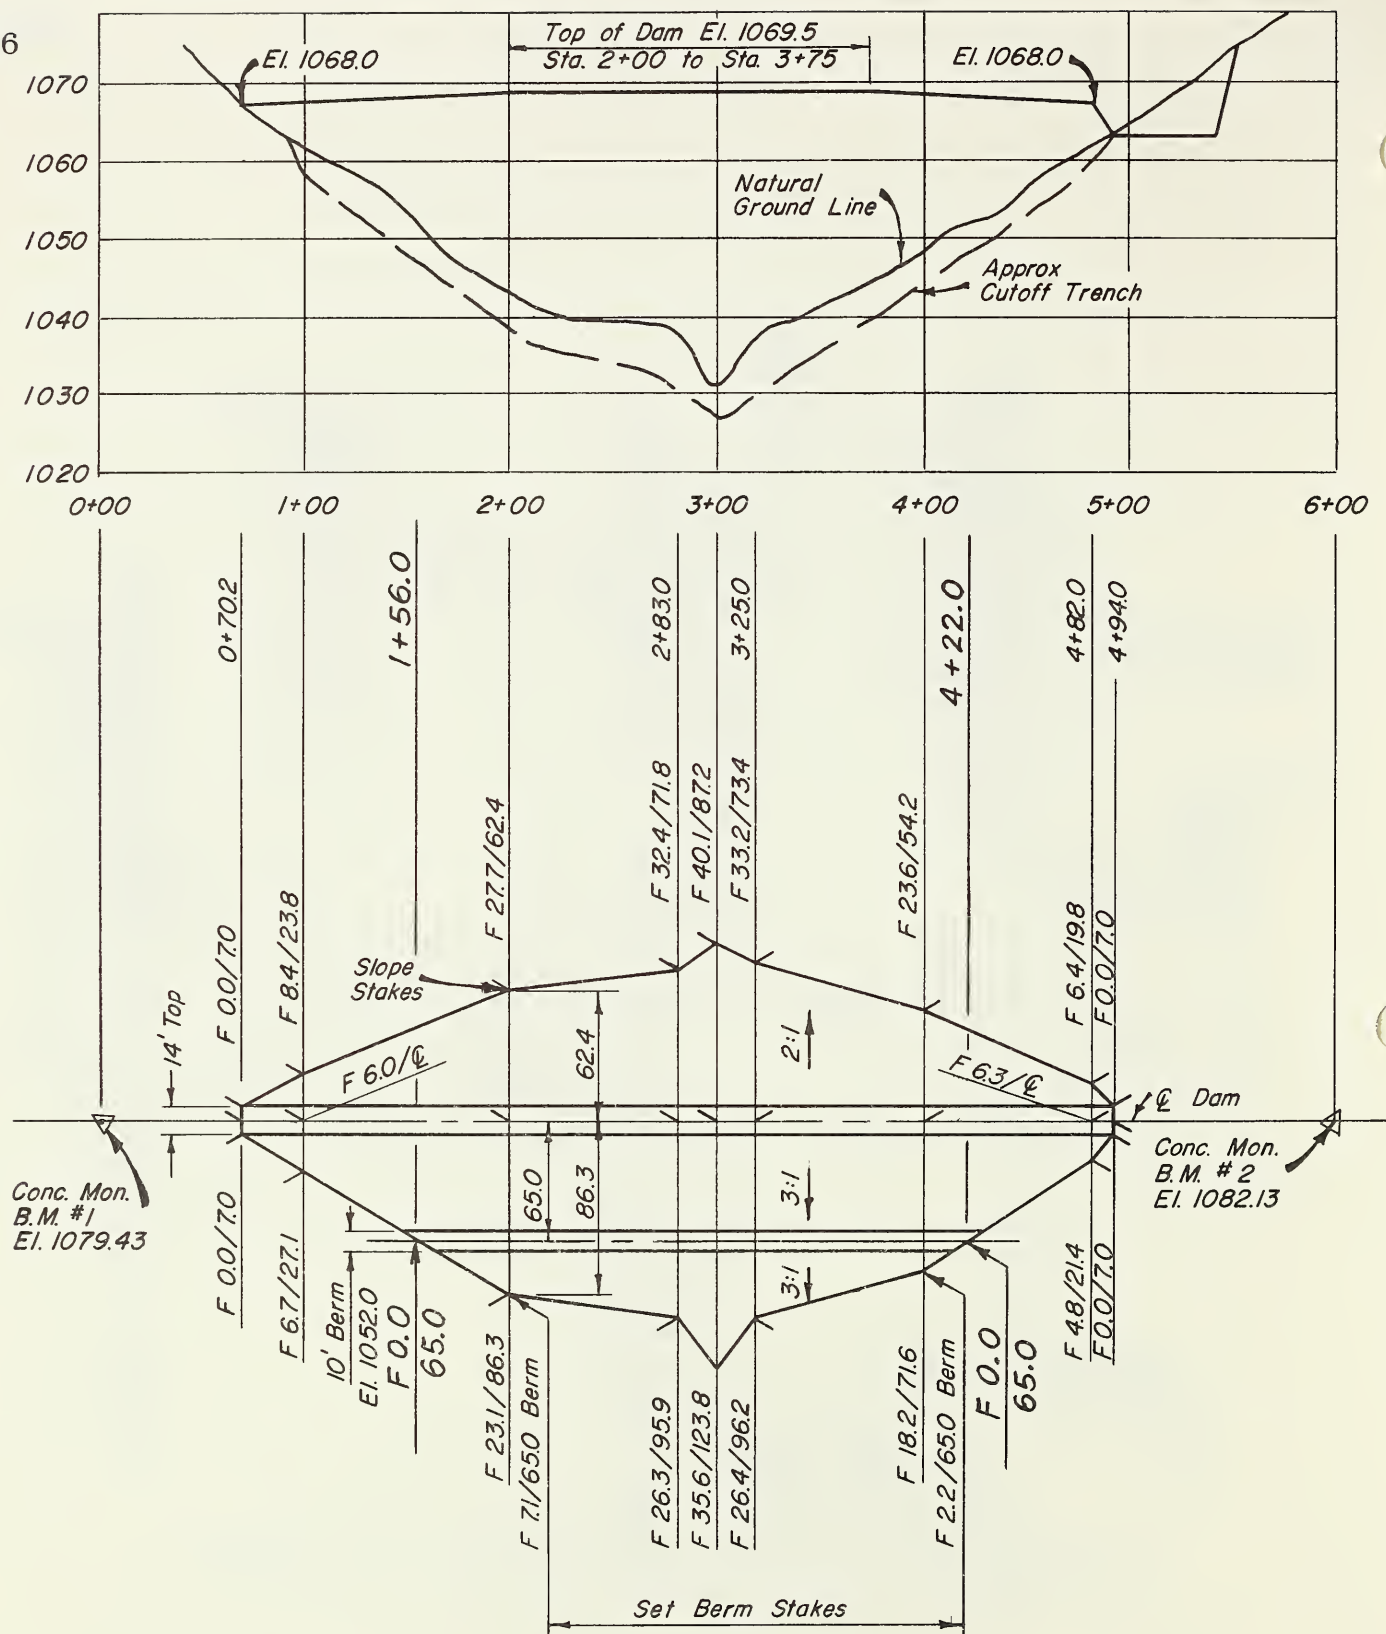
EXAMPLE FOR STAKING DAM EMBANKMENTS
